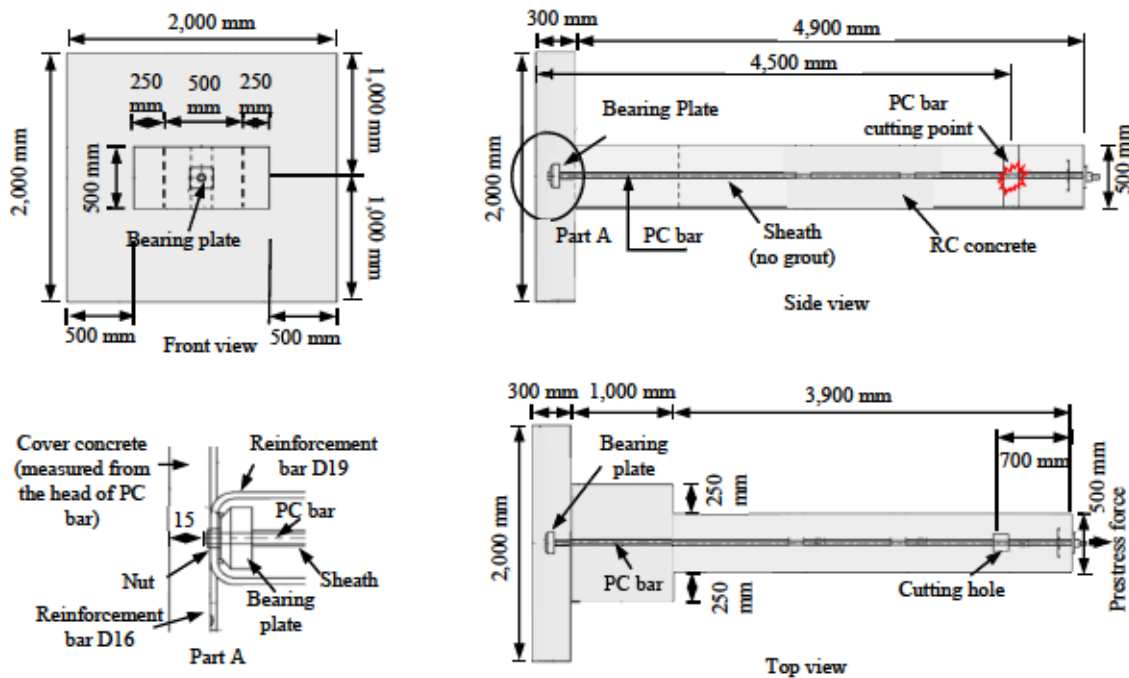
Specimen details with 15 mm cover concrete [1]
